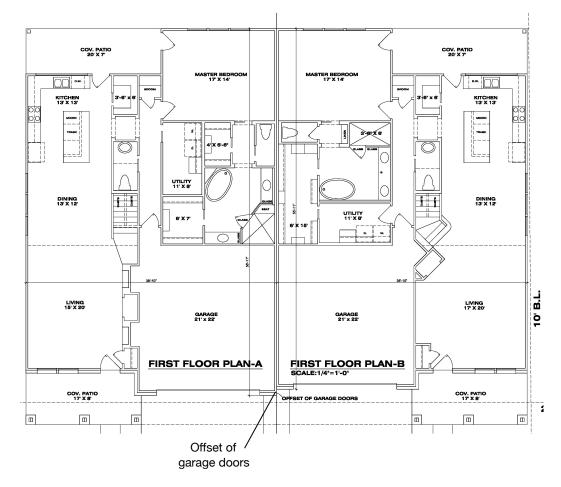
EXHIBIT C for ZC#19-016 CONCEPUTAL BUILDING ELEVATIONS, ROOF PLAN AND FLOOR PLAN
